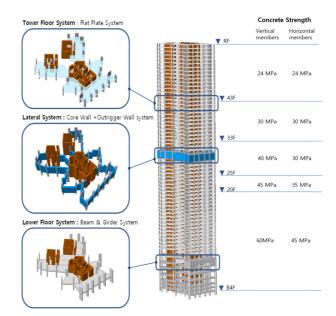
Tower Structural System and Concrete Strength of Vertical and Horizontal Members.
